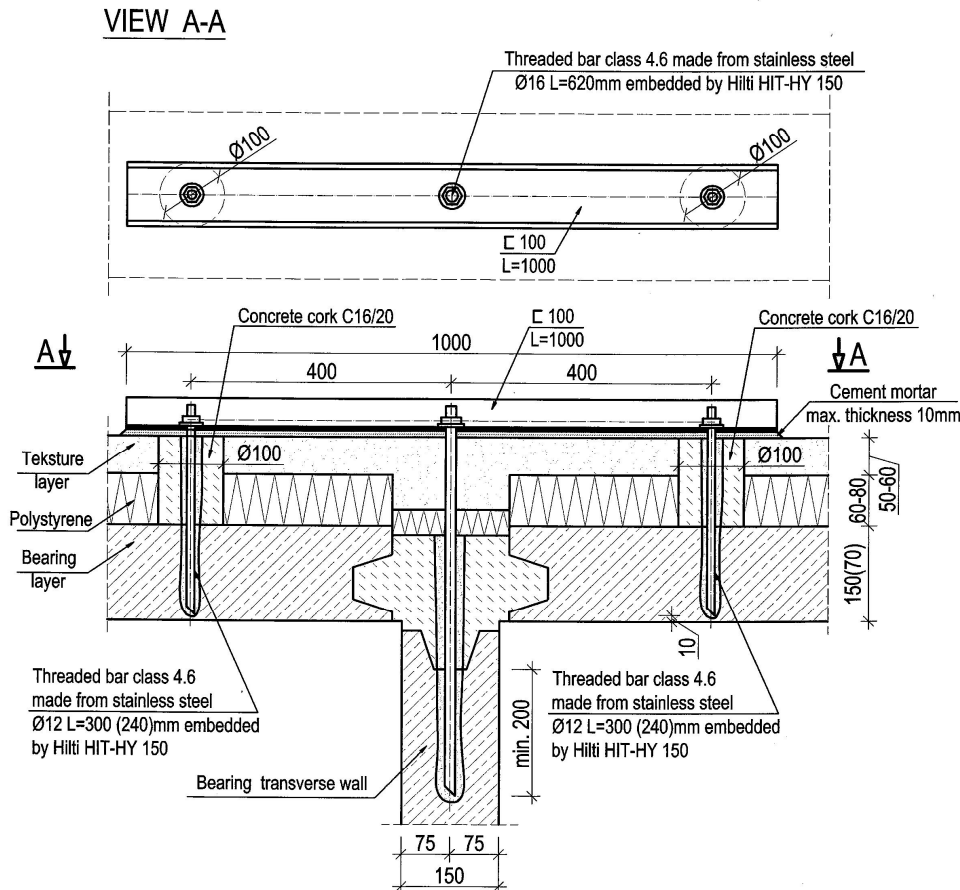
Anchoring external wall elements in transverse load-bearing walls [6]
